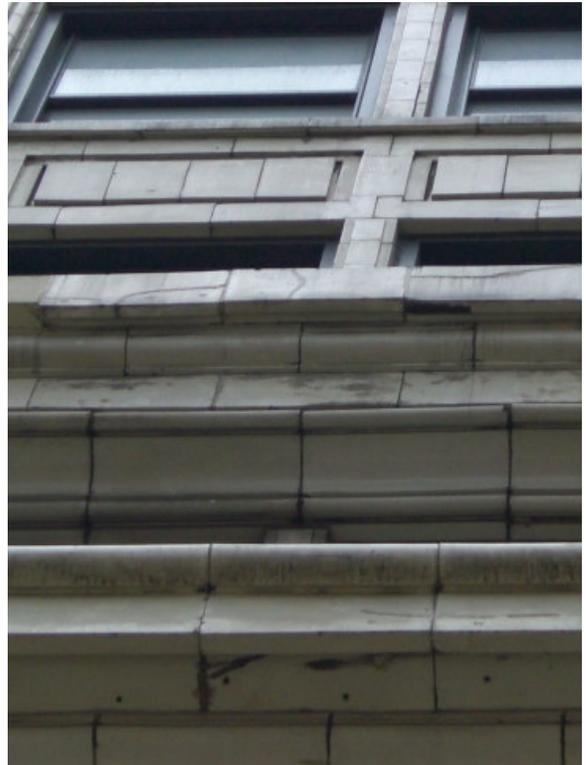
Stresses in terra cotta resulting from anchor failure and stresses in wall.
